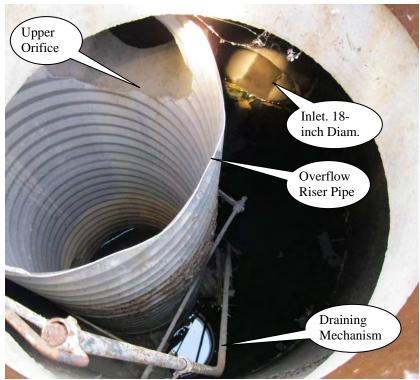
Interior view from Access N to flow control manhole. Shows draining mechanism and top of riser pipe. Inlet illuminated by flashlight (Point E on Operational Plan in Appendix A)
